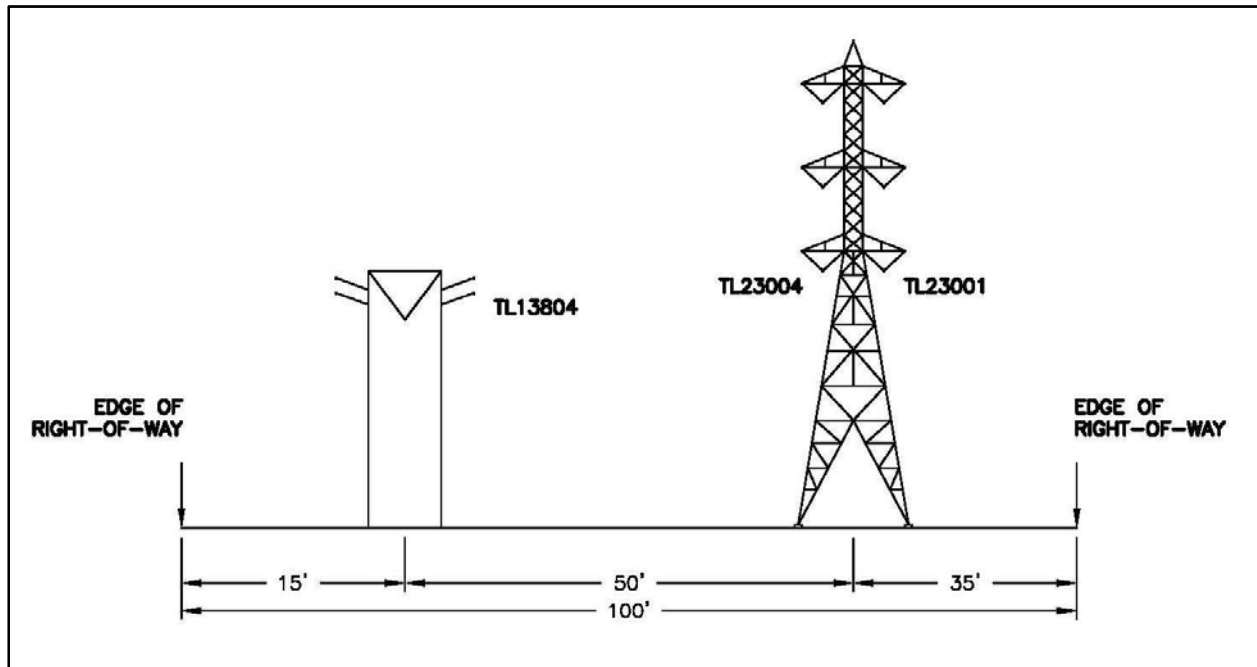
Segment C Existing ROW Cross Section (View North)
